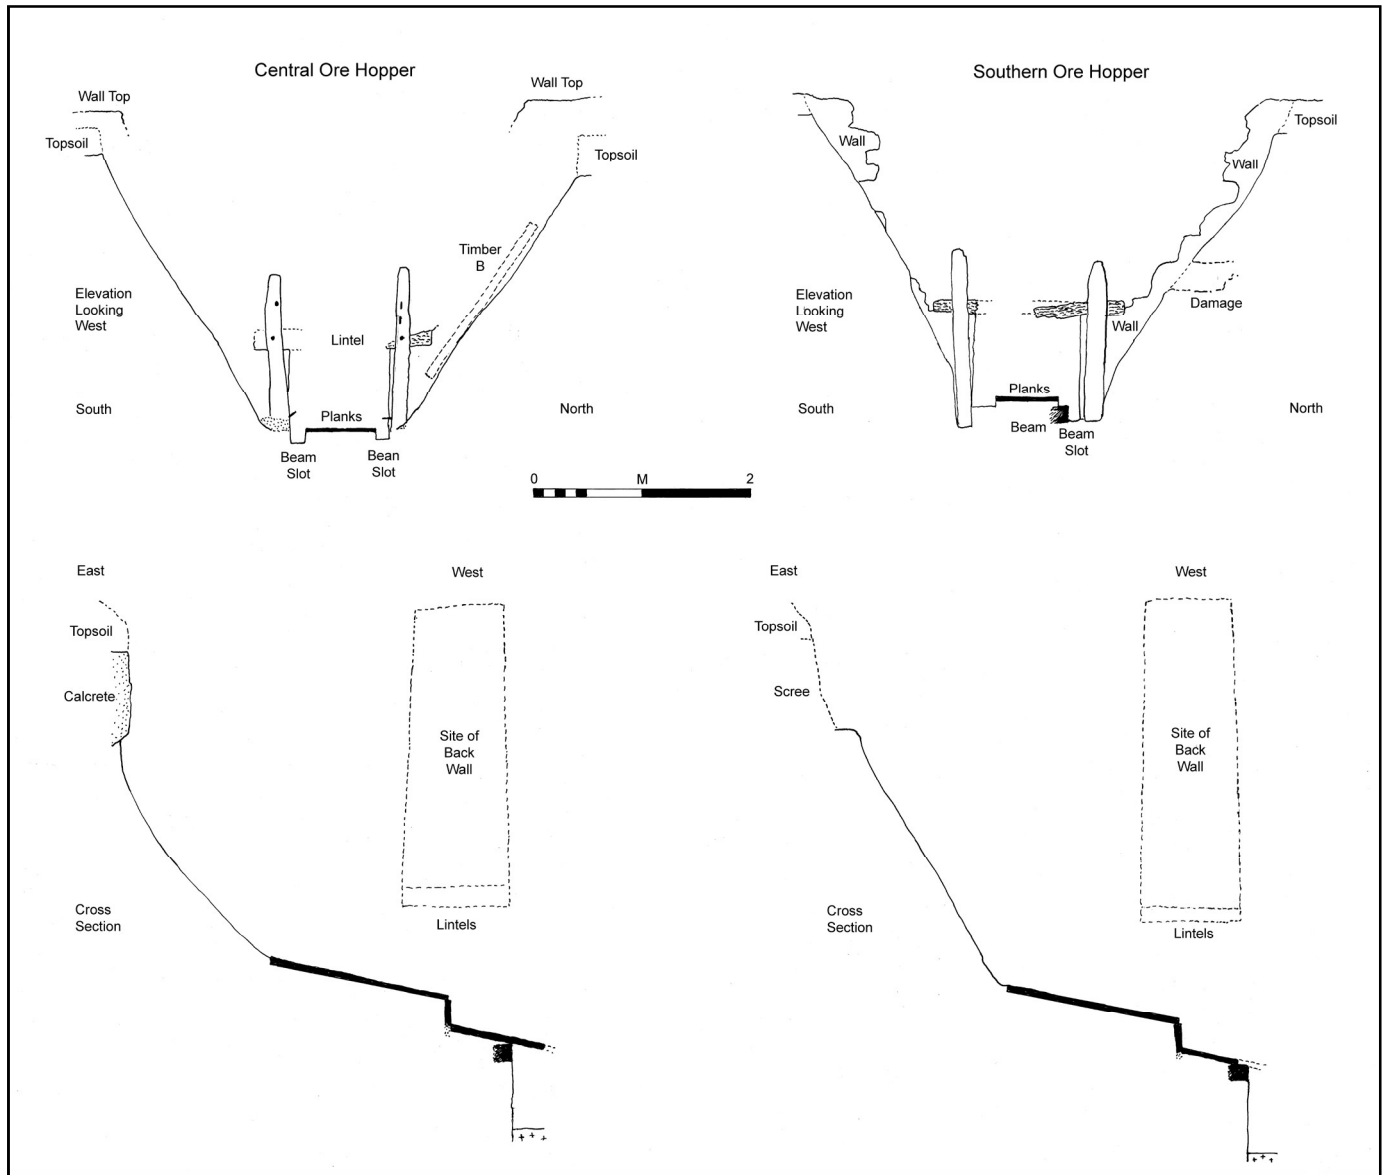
Elevations and cross sections of the central and southern ore hoppers.
